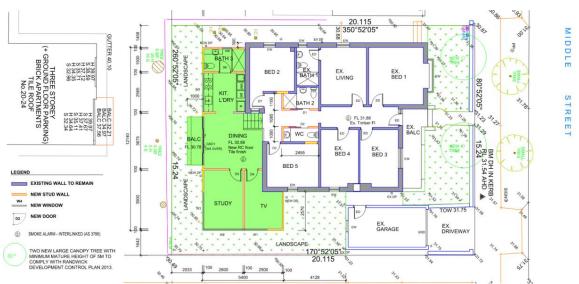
Proposed ground floor plan (Source: City Rhythm Pty Ltd)
